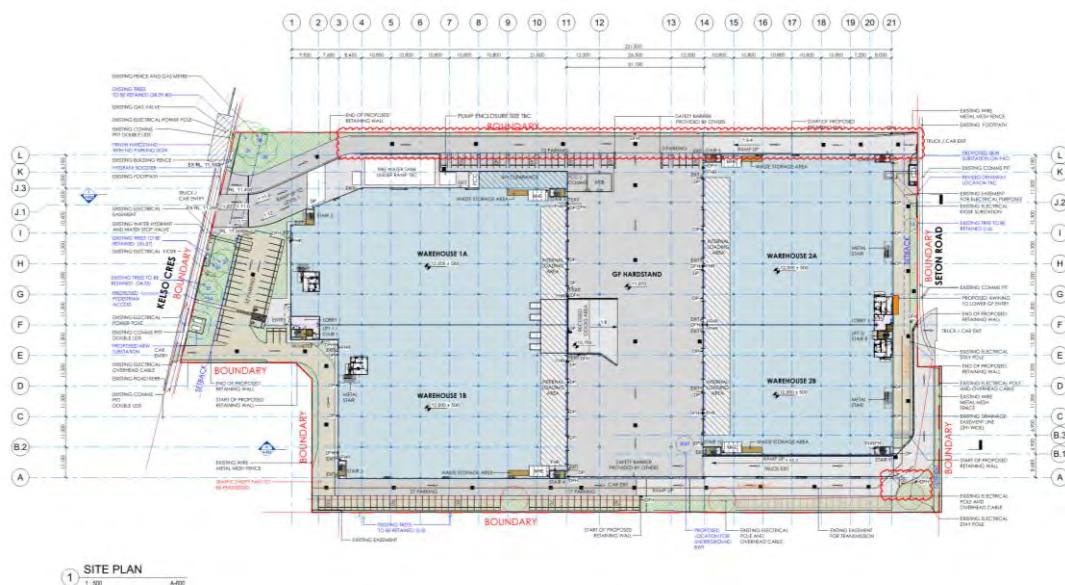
Proposed Development – Site Plan (Source: Pace Architects)
